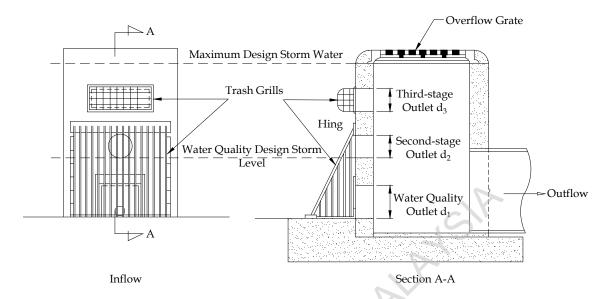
Typical Multistage Primary Outlet Trash Racks (DID, 2000)
